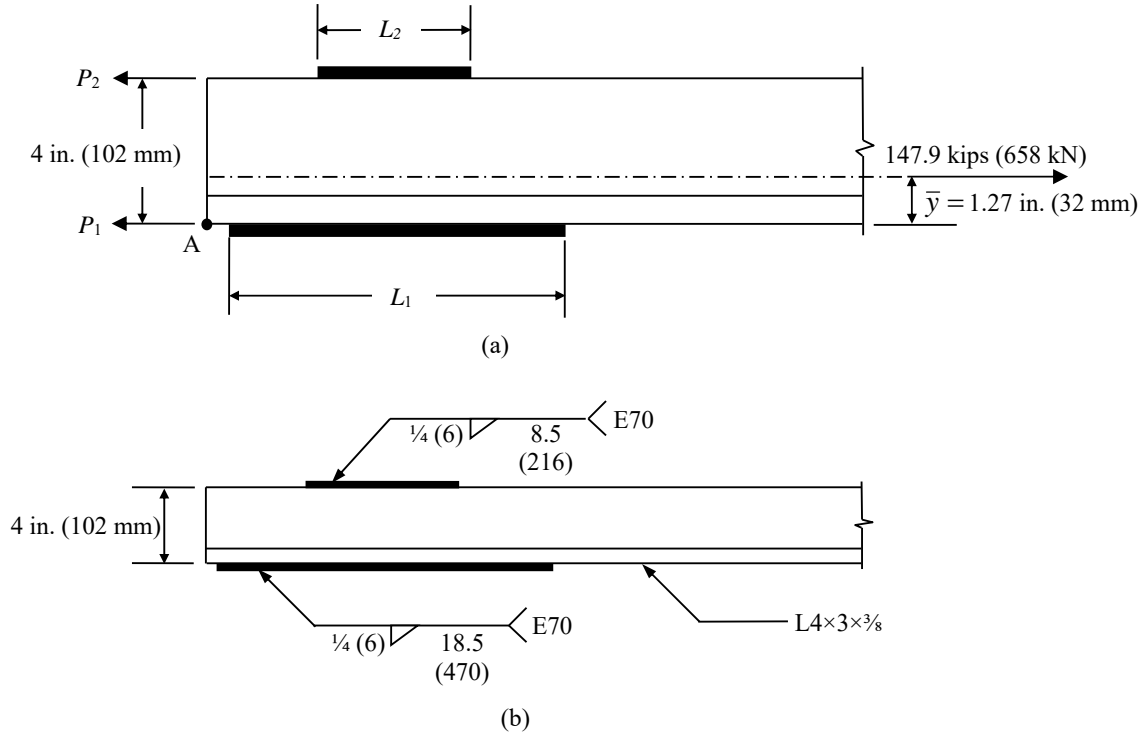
Unequal-Length Longitudinal Fillet Weld Connection for the L4×3× $\frac{3}{8}$ Tension Member
